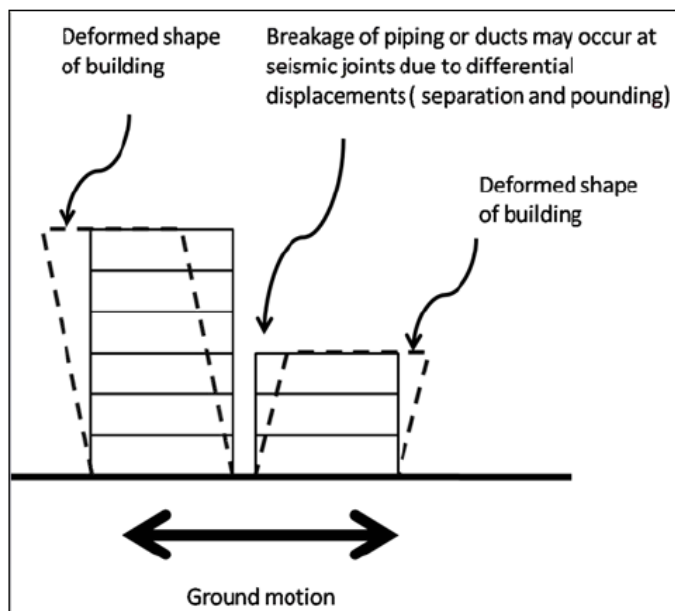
Nonstructural damage due to separation and pounding (FEMA 74. 2011)
